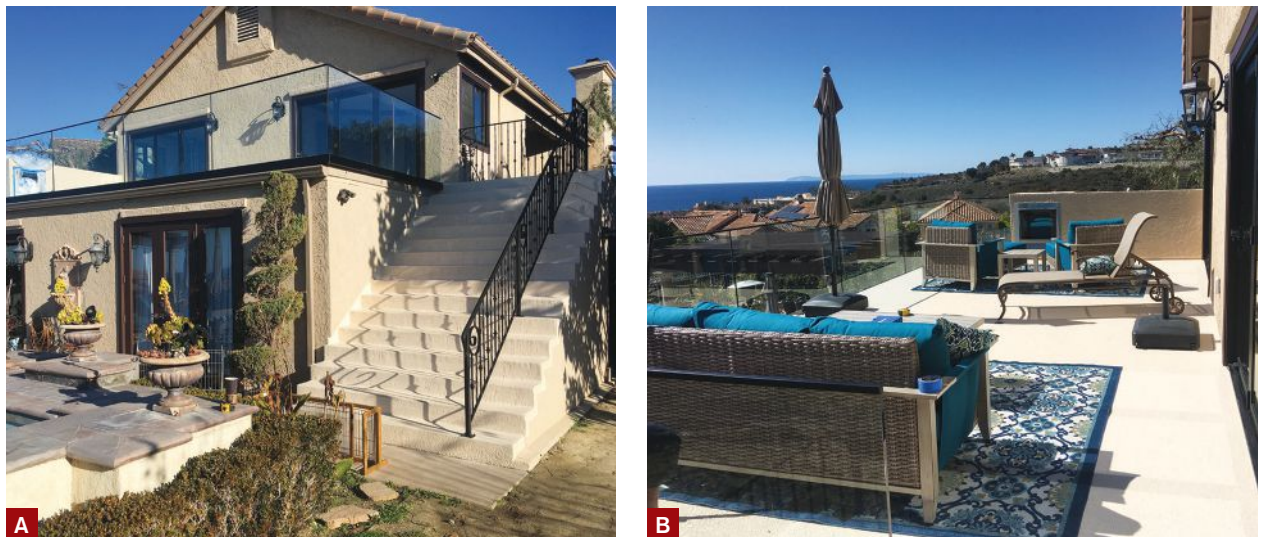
The stairs received the same stucco and Silcor finish as the roof deck, followed by a fire-retardant paint, creating a dry, nonflammable space for storage underneath (A). The stairs were fitted with a wrought iron railing, while the deck's custom-fabricated glass-panel guard system preserves the views of the Pacific Ocean (B).
